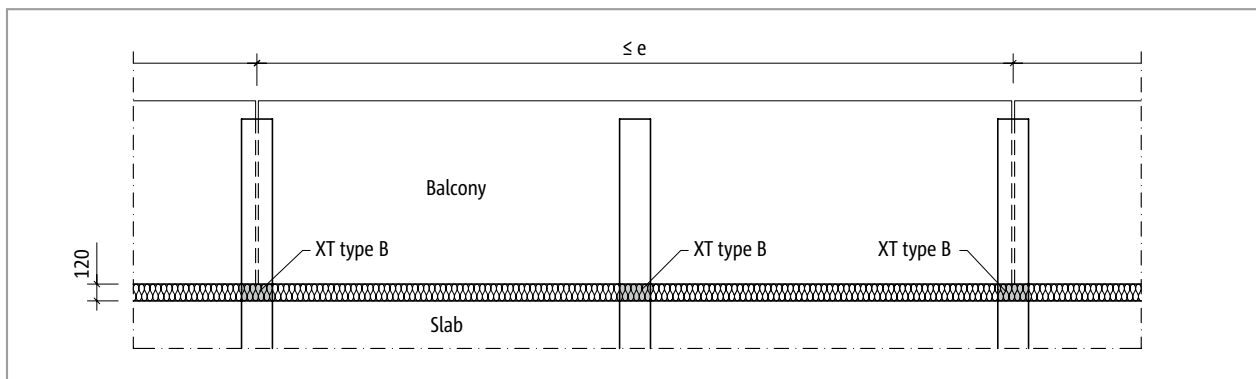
Schöck Isokorb® XT type B: Expansion joint arrangement
